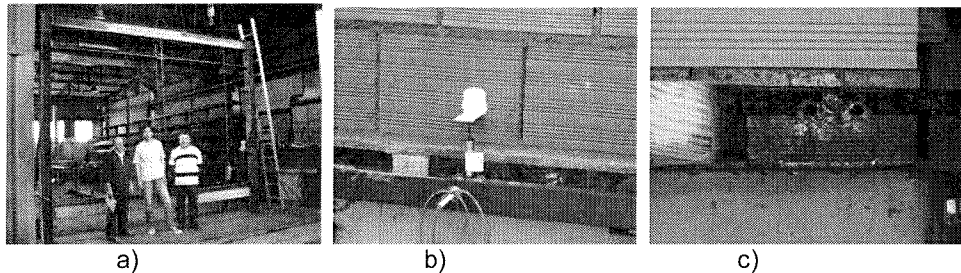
a) General view of the frame; b) Deformation reading equipment c) Lower beam used to the indirect support of the wall, its steel plate and steel support.
